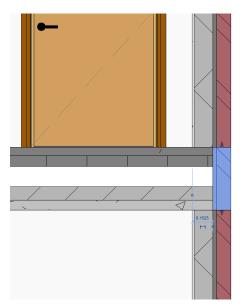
New external wall created at the front of the slab aligned with the external side of the existing walls on the upper and lower levels.
